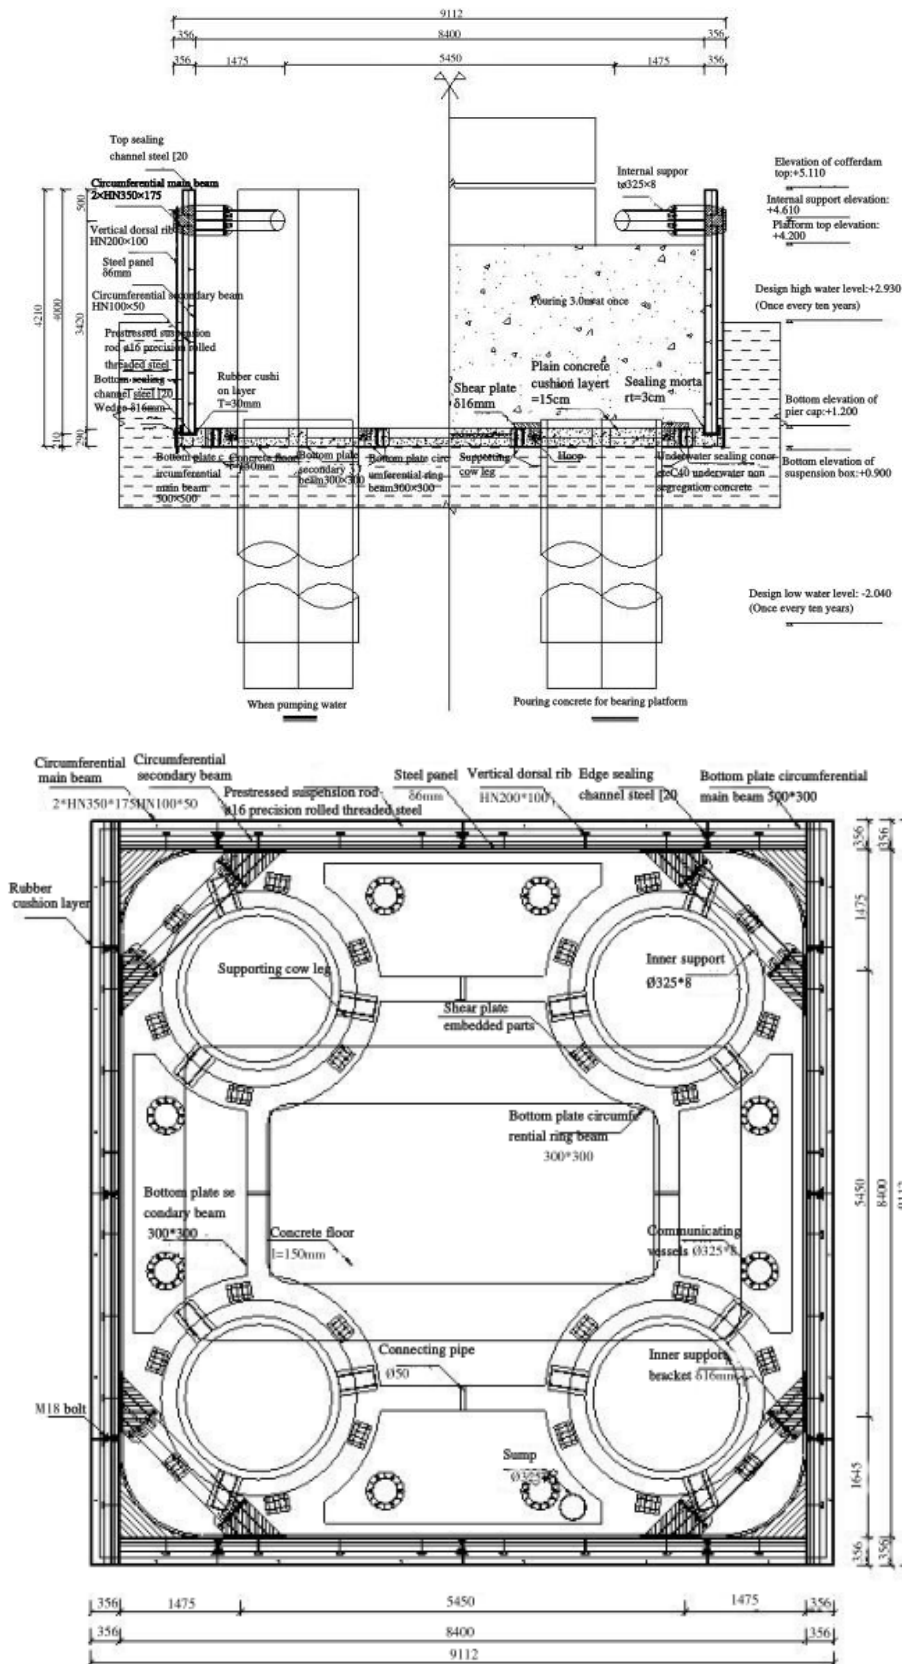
Unsealed steel-concrete composite suspension box structure (Unit: mm).
